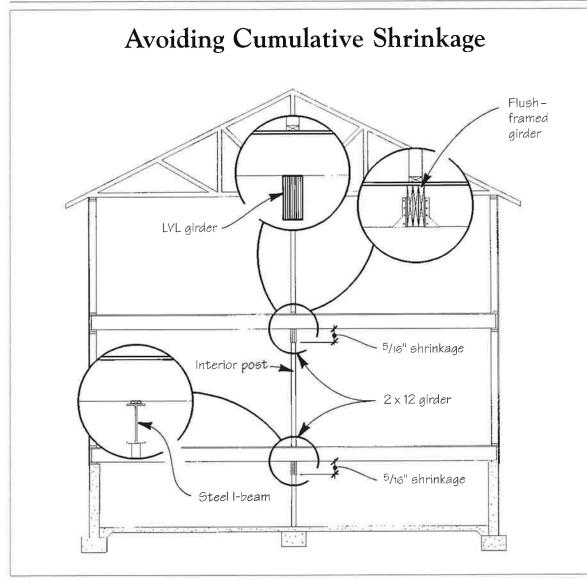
Watch out for situations where wood shrinkage can compound to create noticeable problems. In the house shown here, the two builtup 2x12 girders will cause the center bearing wall to shrink much more than the exterior walls. This will result in a 1/2-inch drop at the second floor level enough to cause nail pops and cracks in the finishes. Using a steel I-beam in the basement and engineered lumber or flush framing at the second floor will alleviate the problem.
